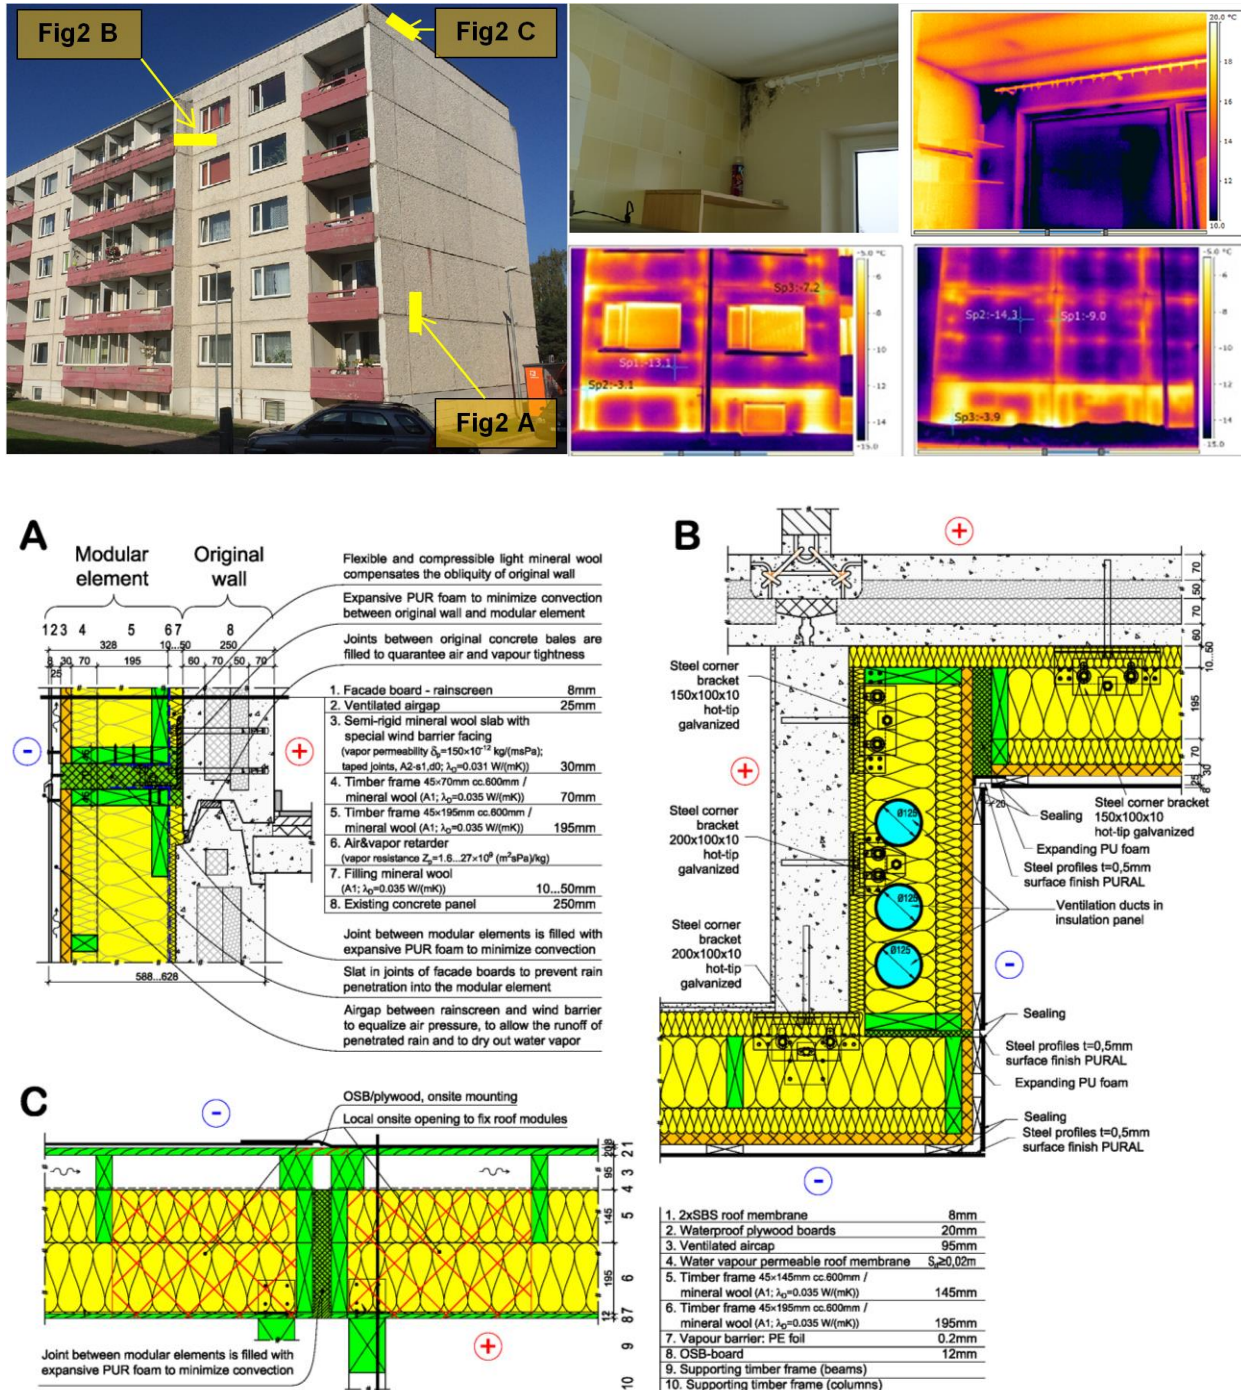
Overview of the pilot building before renovation from outside (above left) and inside (above right) with thermal camera images and designed solutions at the different structural points of the pilot building (below).
